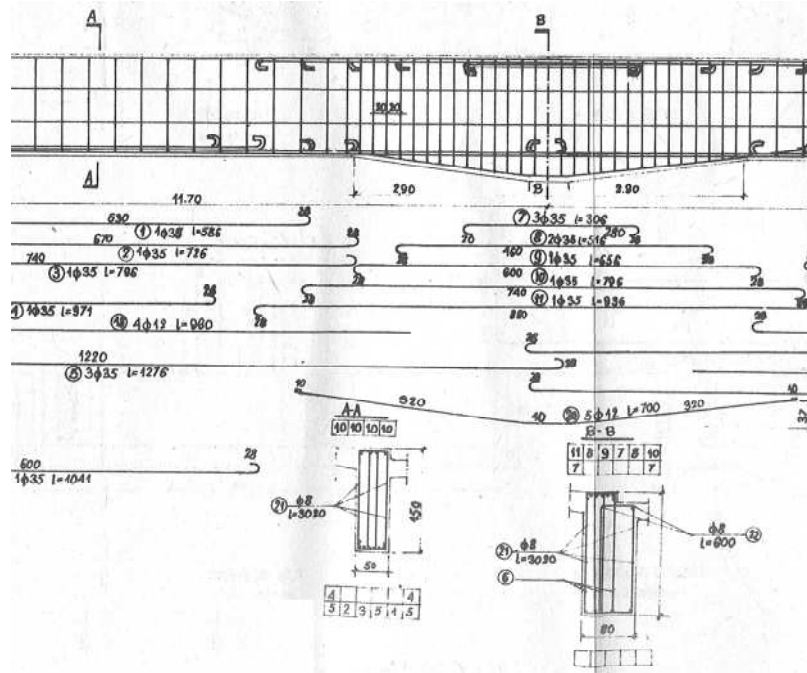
The reinforcing of continuous beam; A-A – in span, B-B – over support; [6], p. 306
